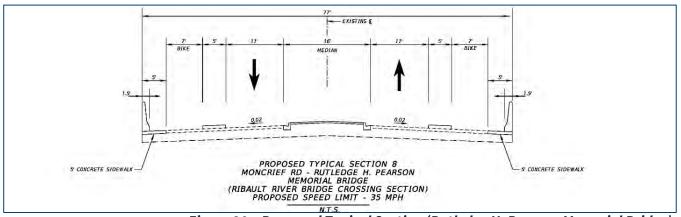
Proposed Typical Section (Rutledge H. Pearson Memorial Bridge)
